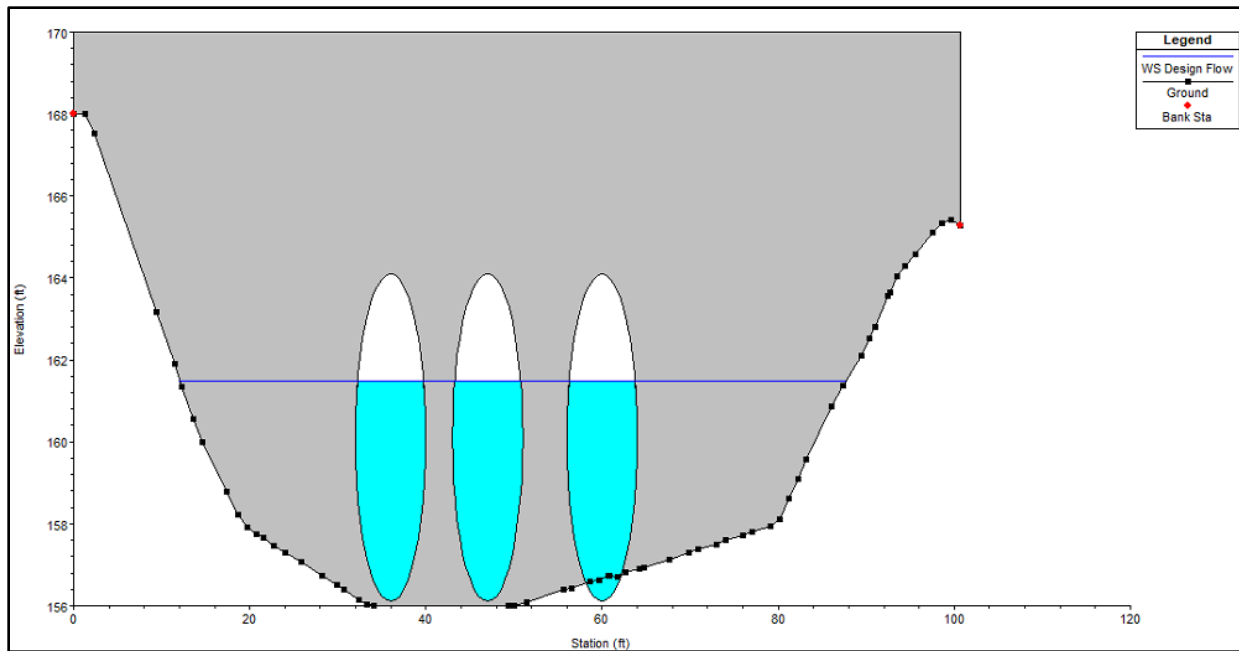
Section View of Northern Crossing and Modeled Water Level at 150 cfs (facing downstream)
